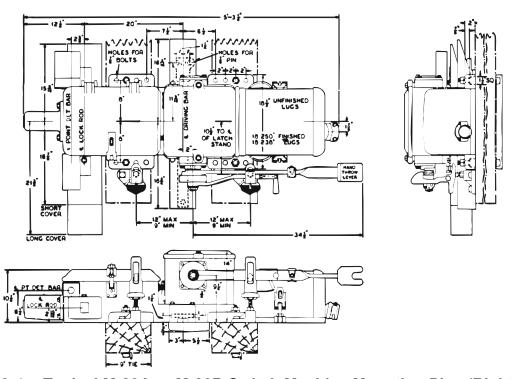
Typical M-23A or M-23B Switch Machine Mounting Plan (Right-Hand Assembly with Adjacent Point Closed)
